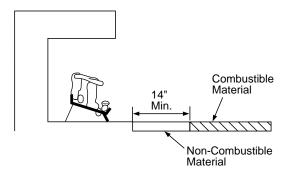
Minimum Fireplace Clearances If Installed at Floor Level
